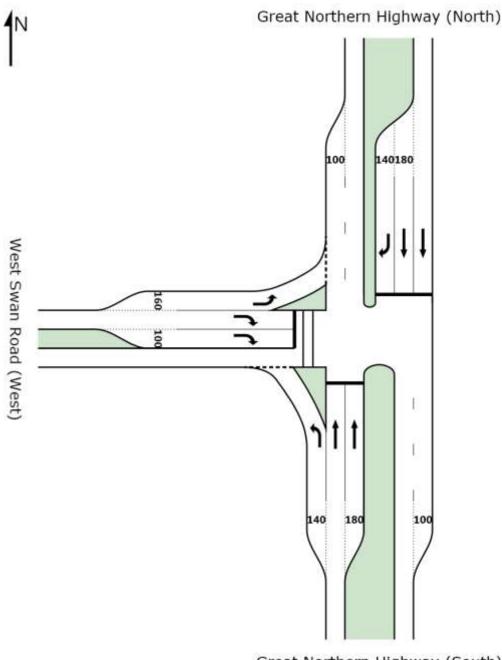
Existing Geometry of Intersection of Great Northern Highway and West Swan Road
